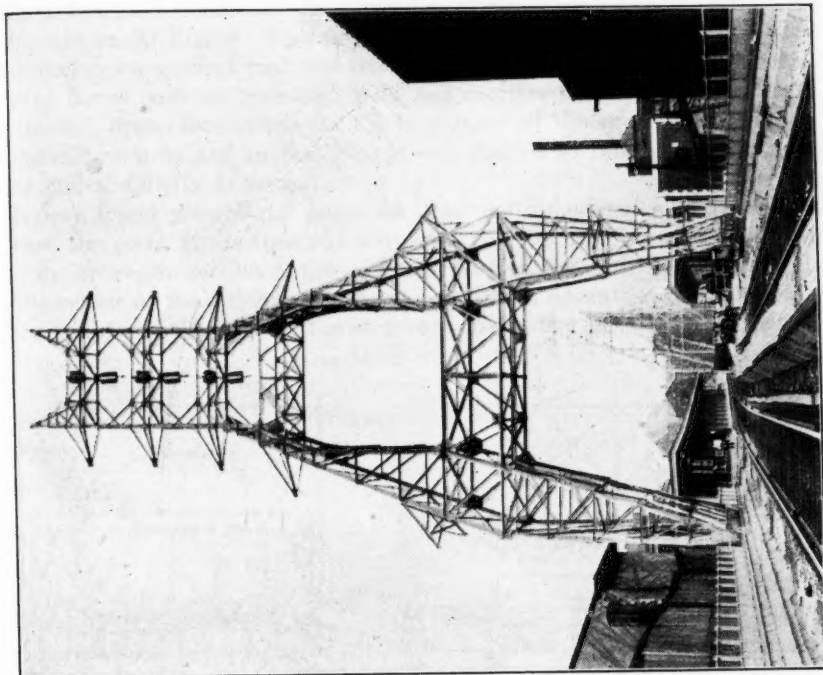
TYPE U BRIDGE STRUCTURE.
